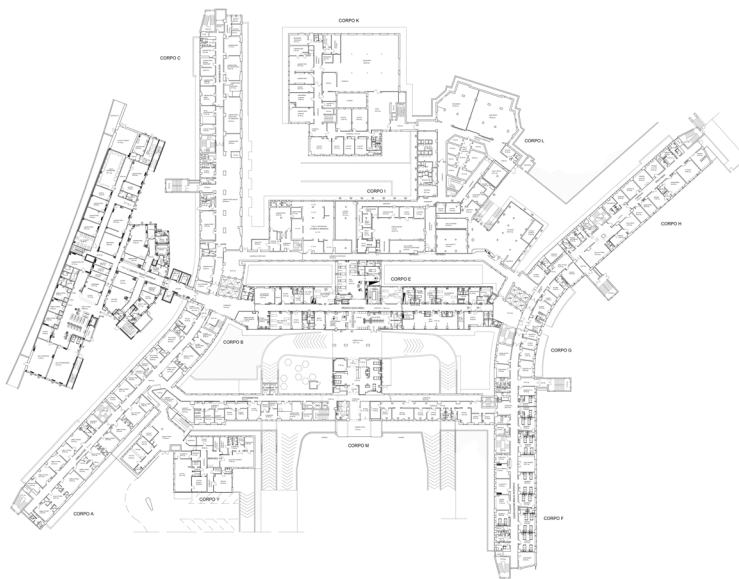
Ground Floor Plan, Cremona Hospital, Monoblock Building
